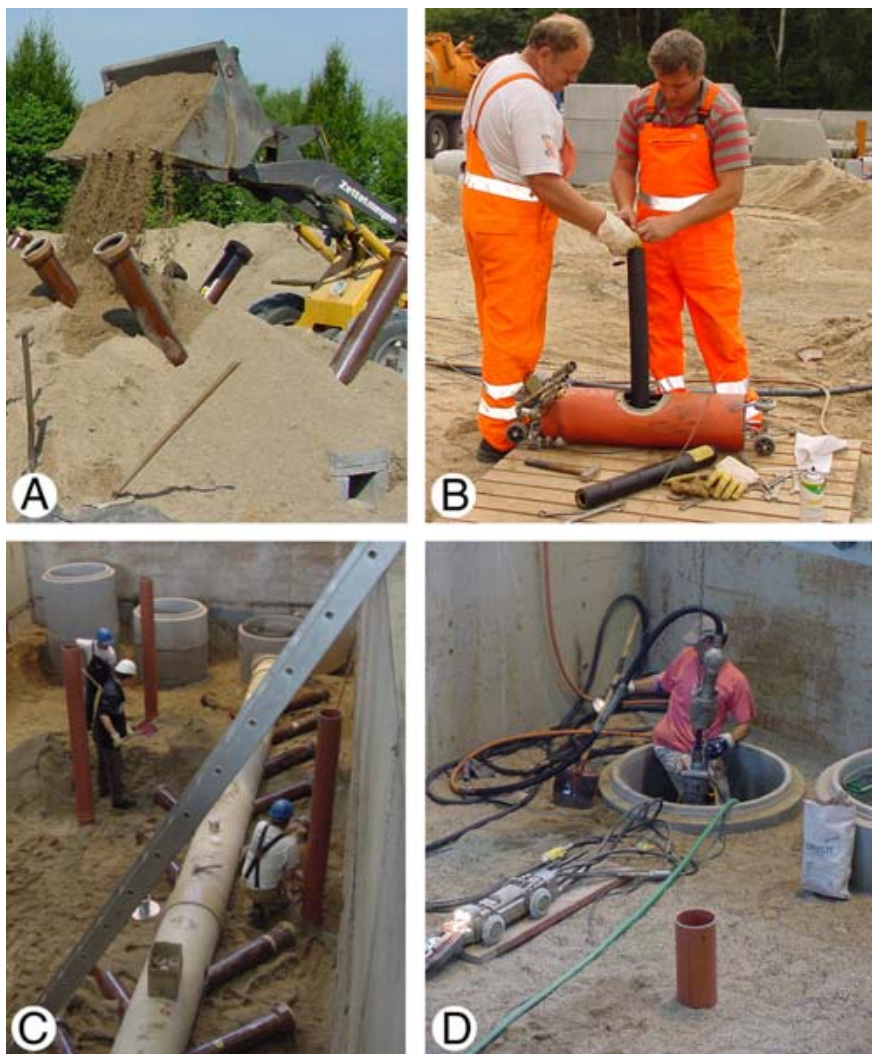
Test section construction and repair execution. A Construction of the outdoor sections. B Preparations for repairing the outdoor sections. C Test section construction on the large-scale test stand (6m x 6m x 15m). D Repair execution on the large-scale test stand.
